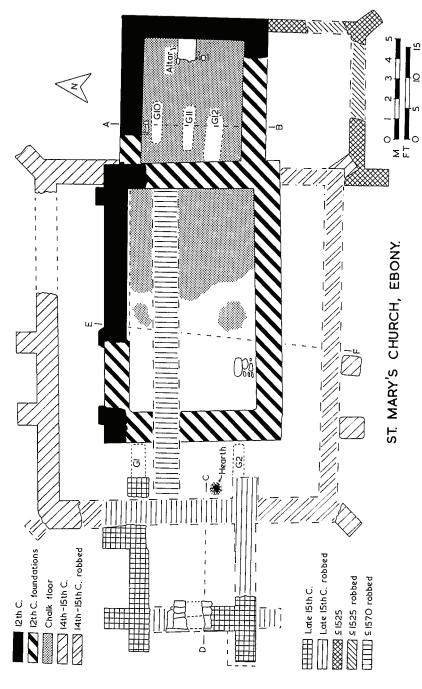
Excavation plan of St. Mary's Church, Chapel Bank, Ebony.
